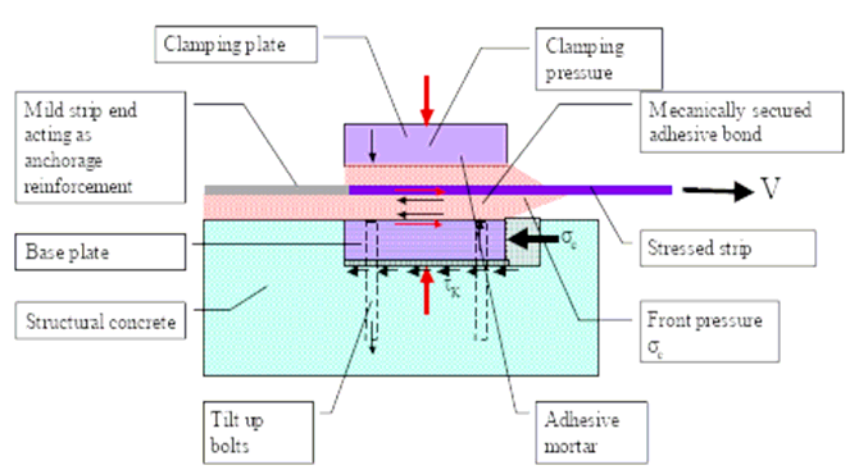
Transfer of prestressing force from the double-lapped permanent anchor to the concrete [9]
